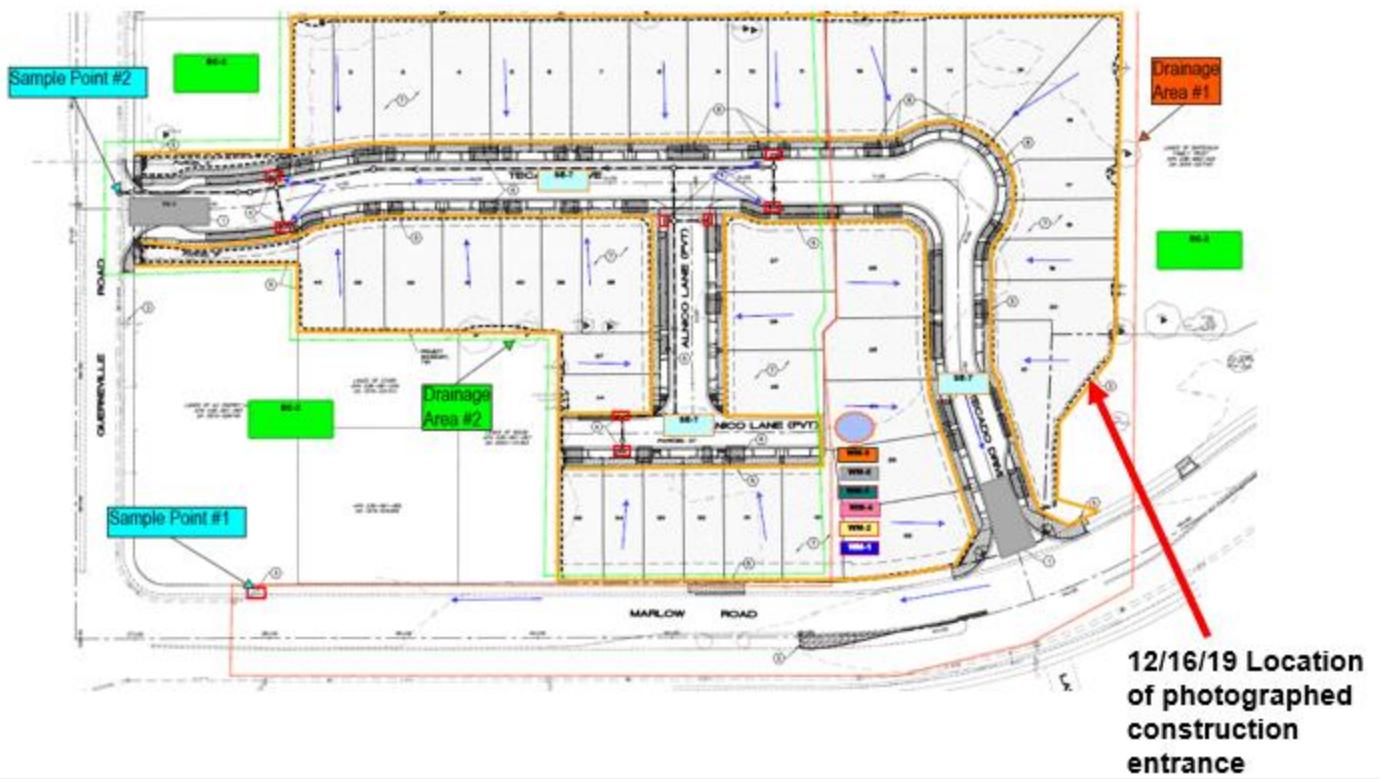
The red arrow points to the location of the observed construction entrance in Photo 1. This figure was obtained from the site SWPPP, SMARTS Attachment ID 2520264 and was edited by Joshua Luders to indicate a location of interest.
